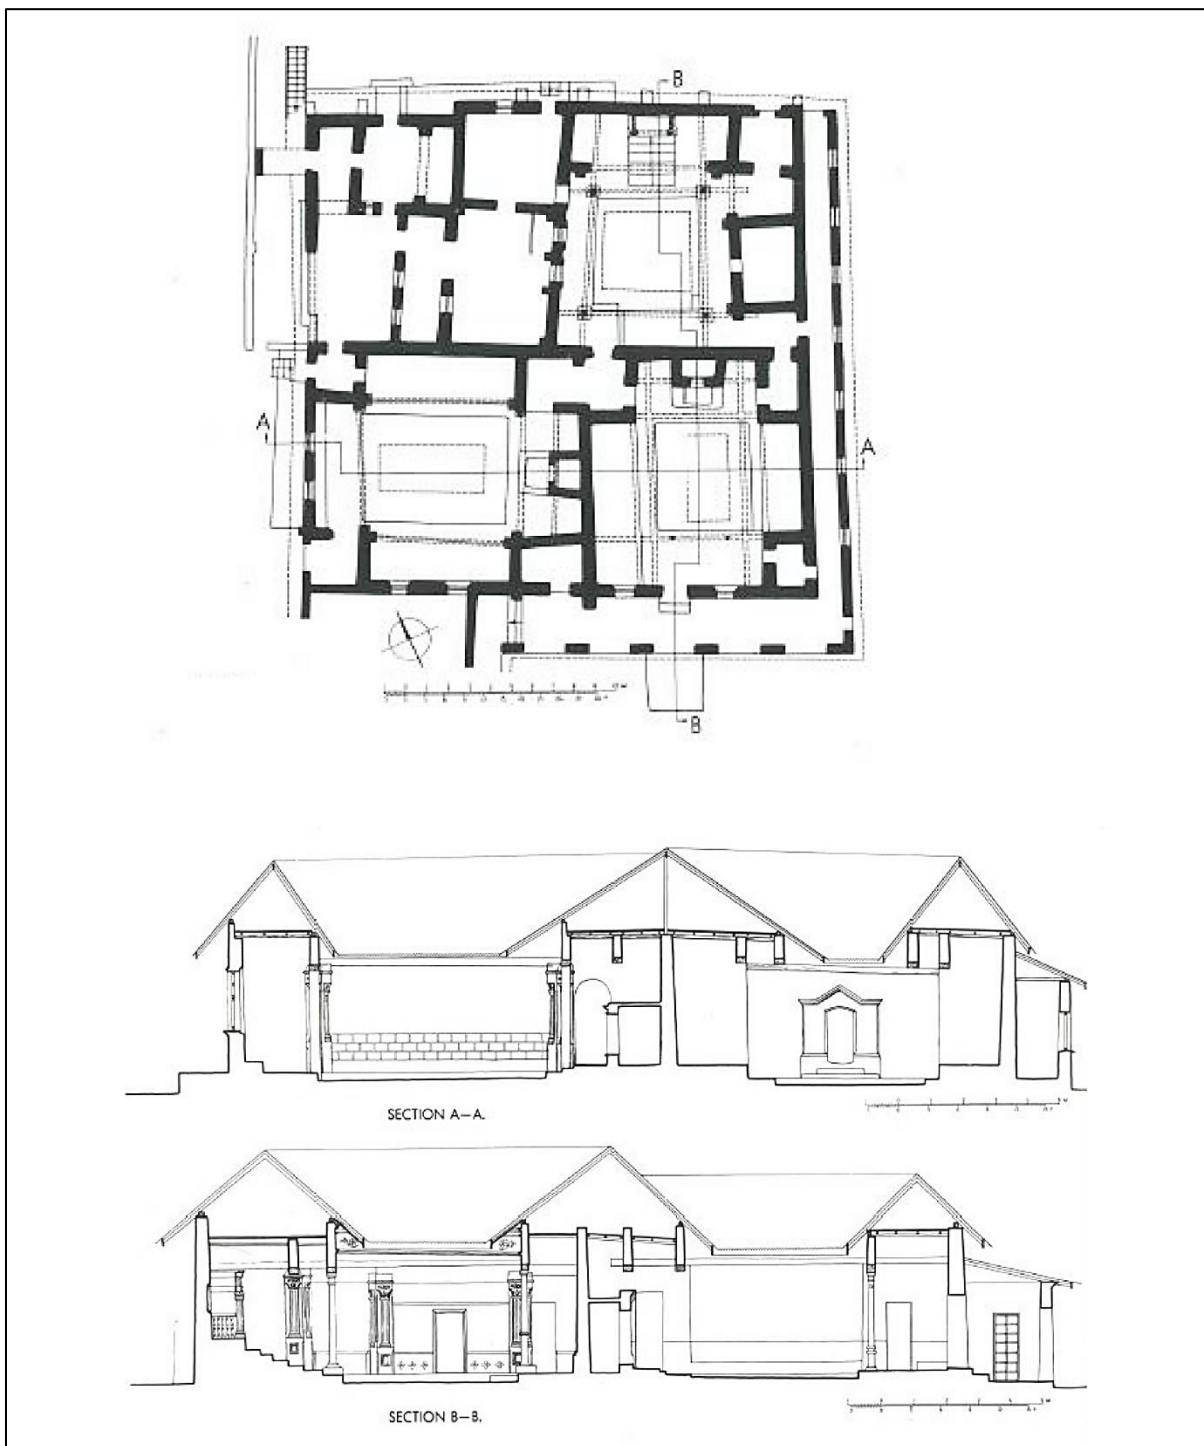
Floor plan and sections of the Lagos *afin* – notice thick earth walls; source: Dmochowski (1990, p.2.53).
